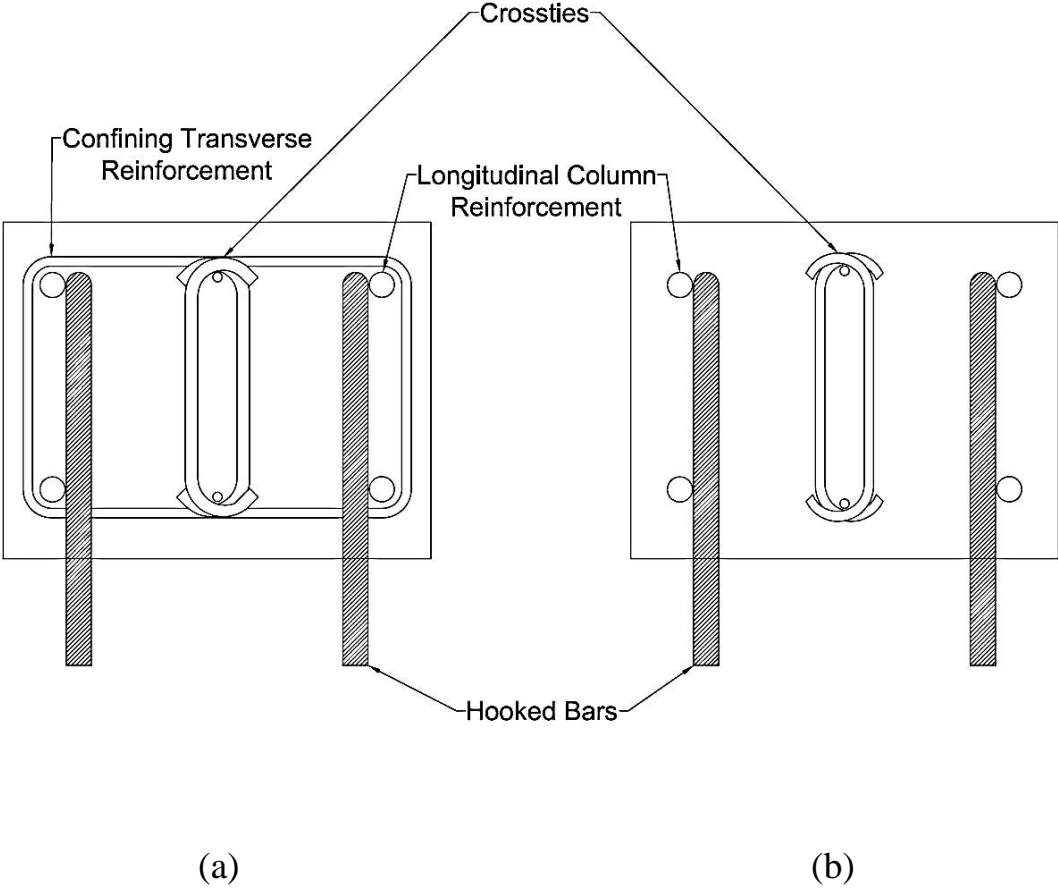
Cross section detail of specimens with (a) confining transverse reinforcement and (b) without confining transverse reinforcement. Shown with No. 3 longitudinal bars supporting the cross ties
